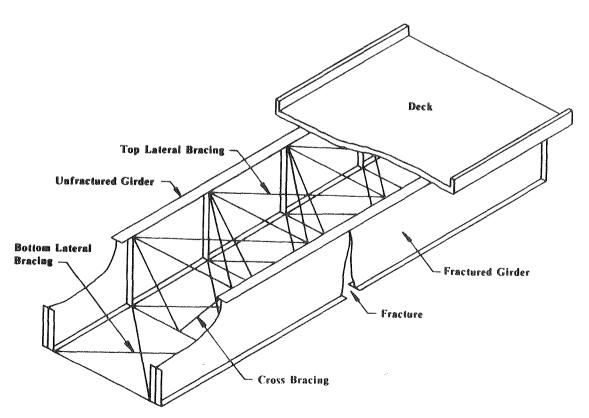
Schematic showing typical components of a redundant bracing system for a simple span bridge.
